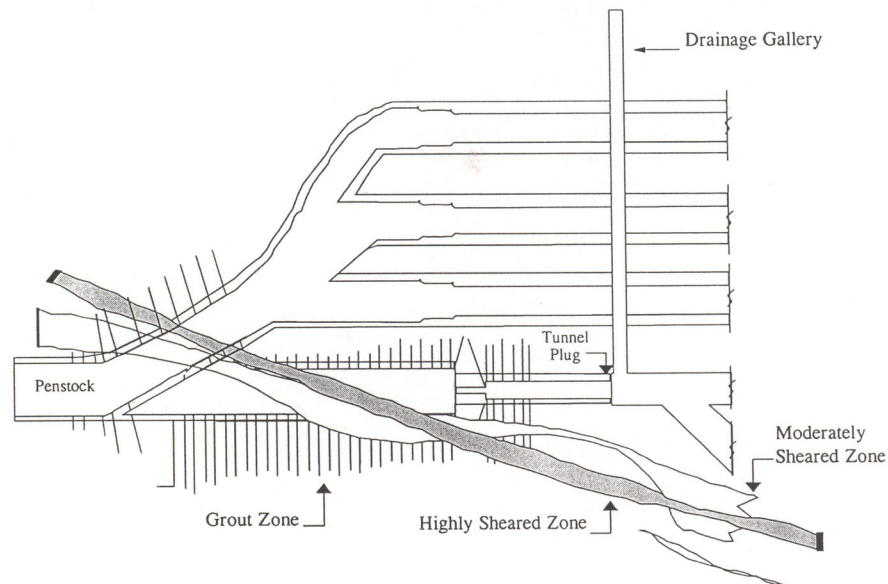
Plan View Showing Location of Shear Zone West of Powerhouse Station.
